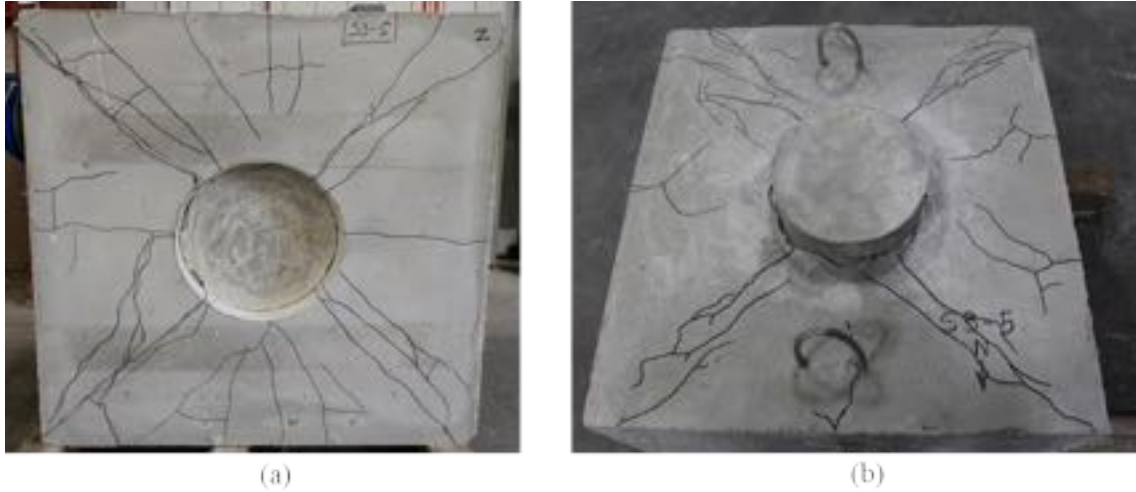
Cracking on (a) cap and (b) bottom of Specimen S3-5
